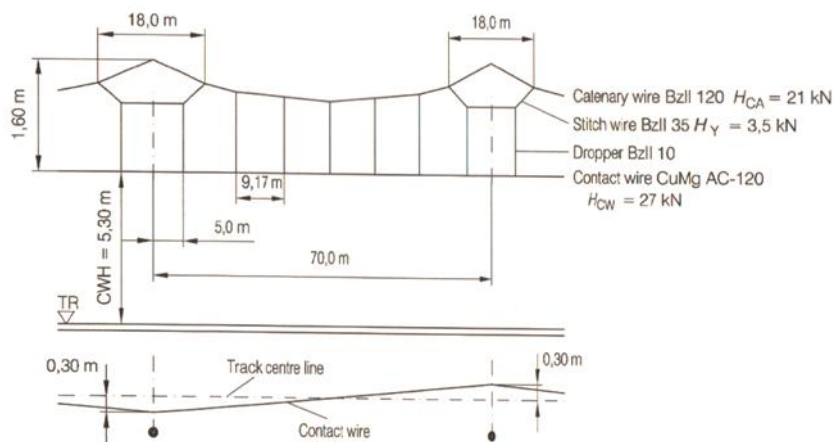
Layout of Siemens overhead contact line design Sicat H1.0.
